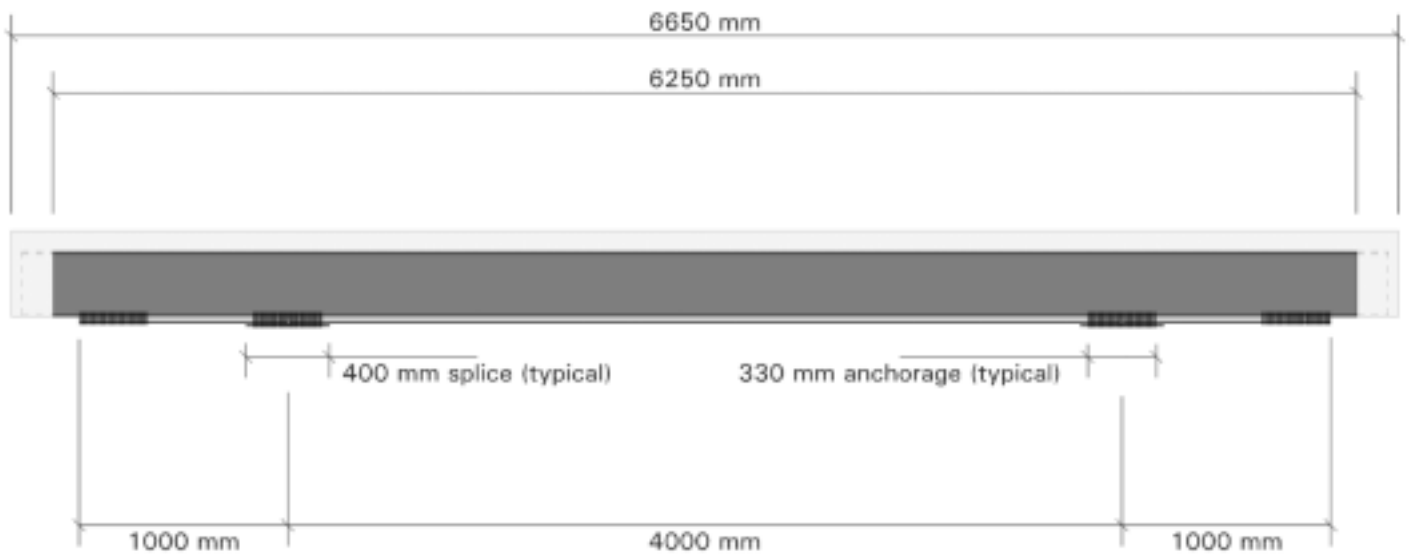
Reinforcement scheme for steel-concrete composite girder (CGAB-I).
